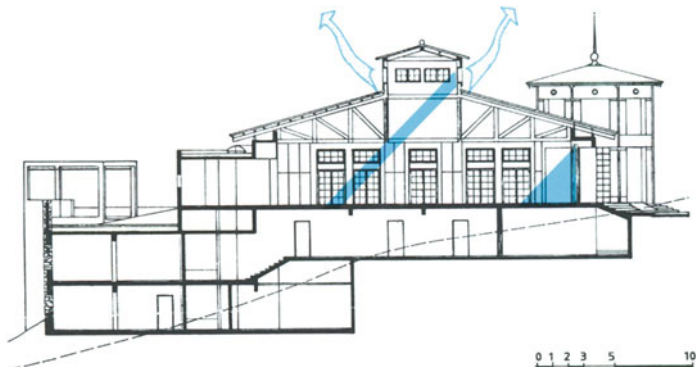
Section through multi-purpose hall showing cross ventilation and daylighting
